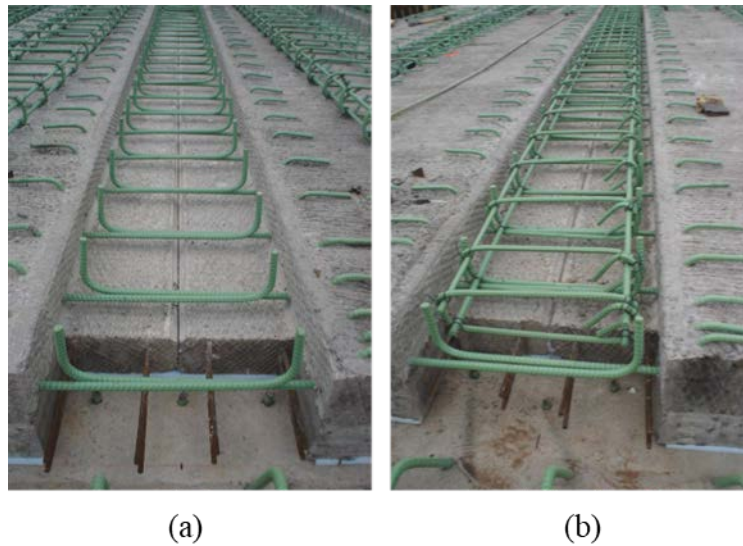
New type of developed joints [11]: (a) joint between PCSS panels (90-degree hooks) and (b) drop-in reinforced cage
